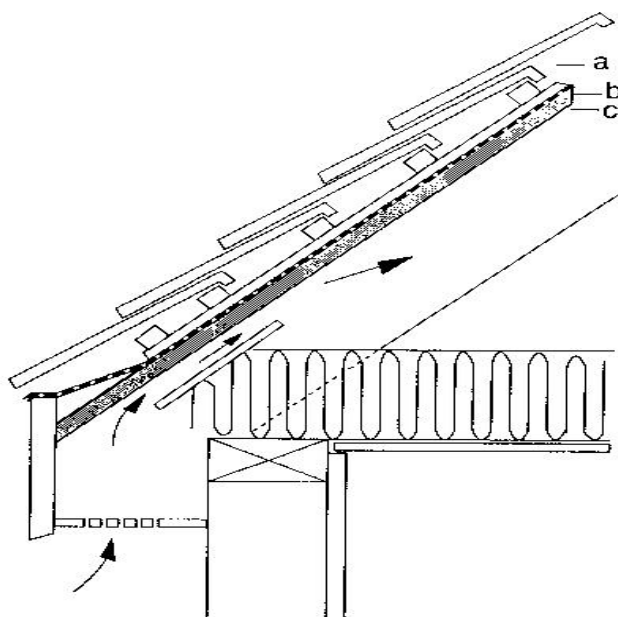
Example of a roofspace with insulation at ceiling level must be adequately ventilated
